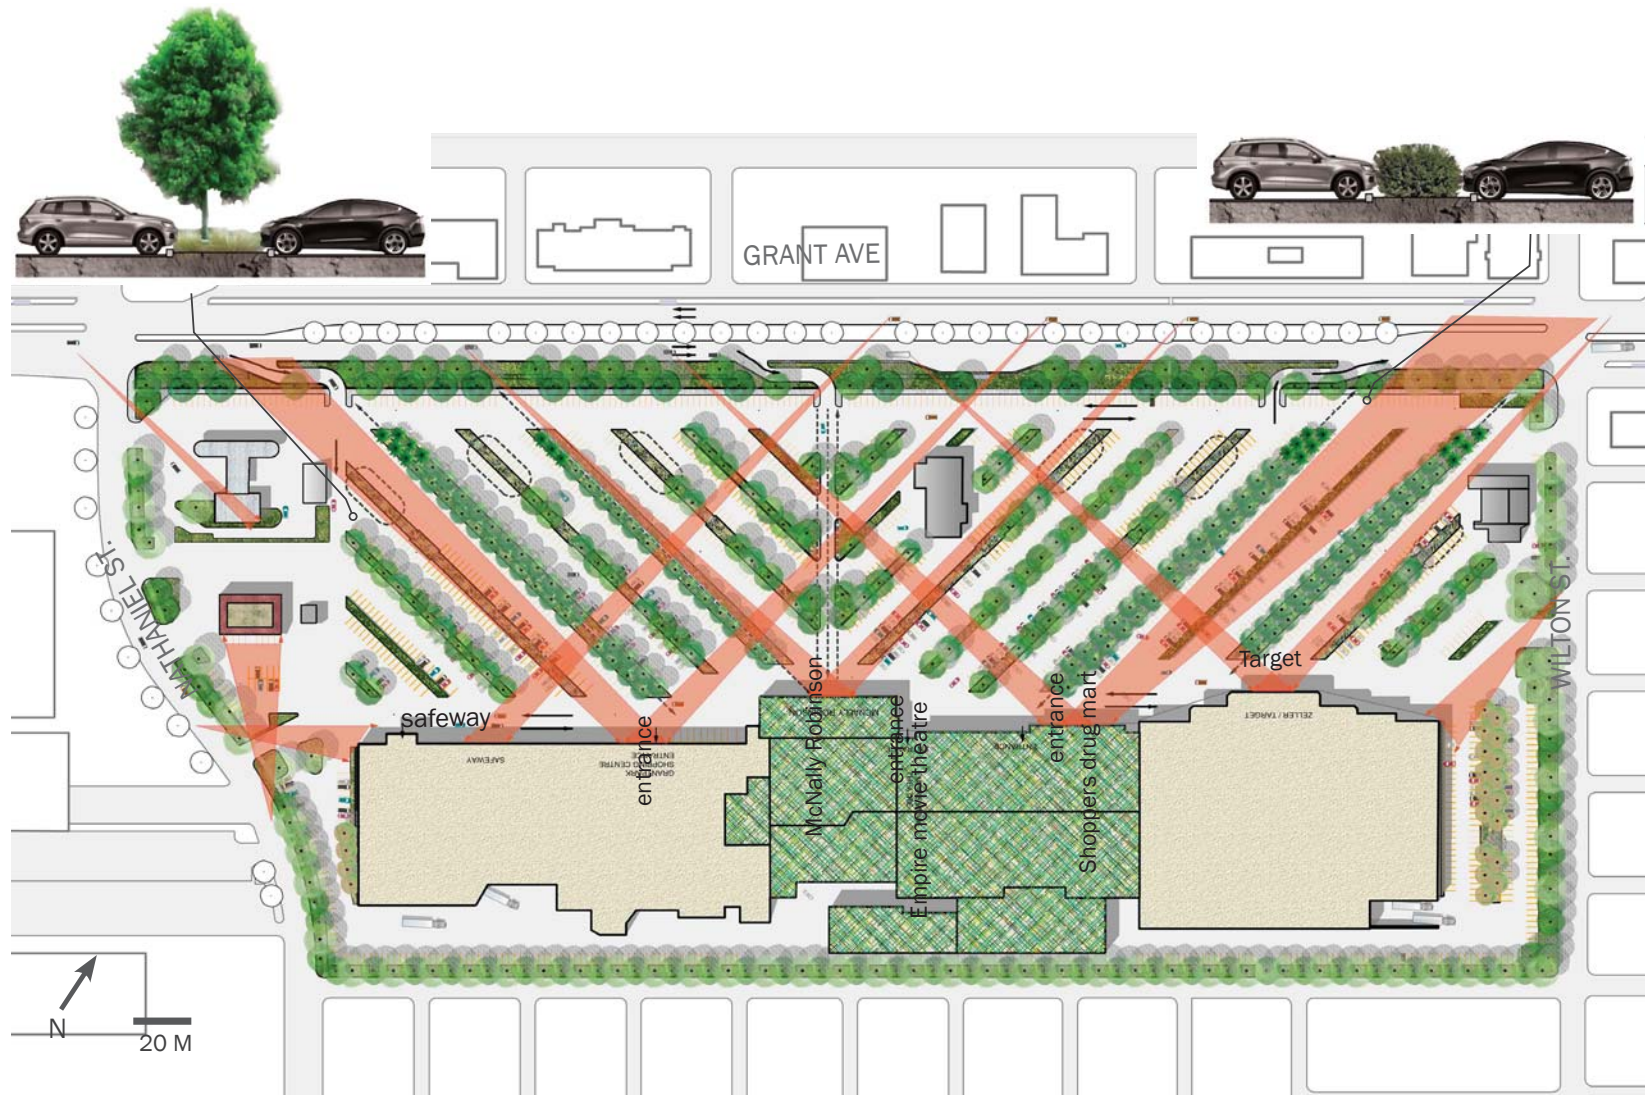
Site Plan - Trees, shrubs and perennials are strategically placed so that views from Grant Avenue to each storefront are maintained.
